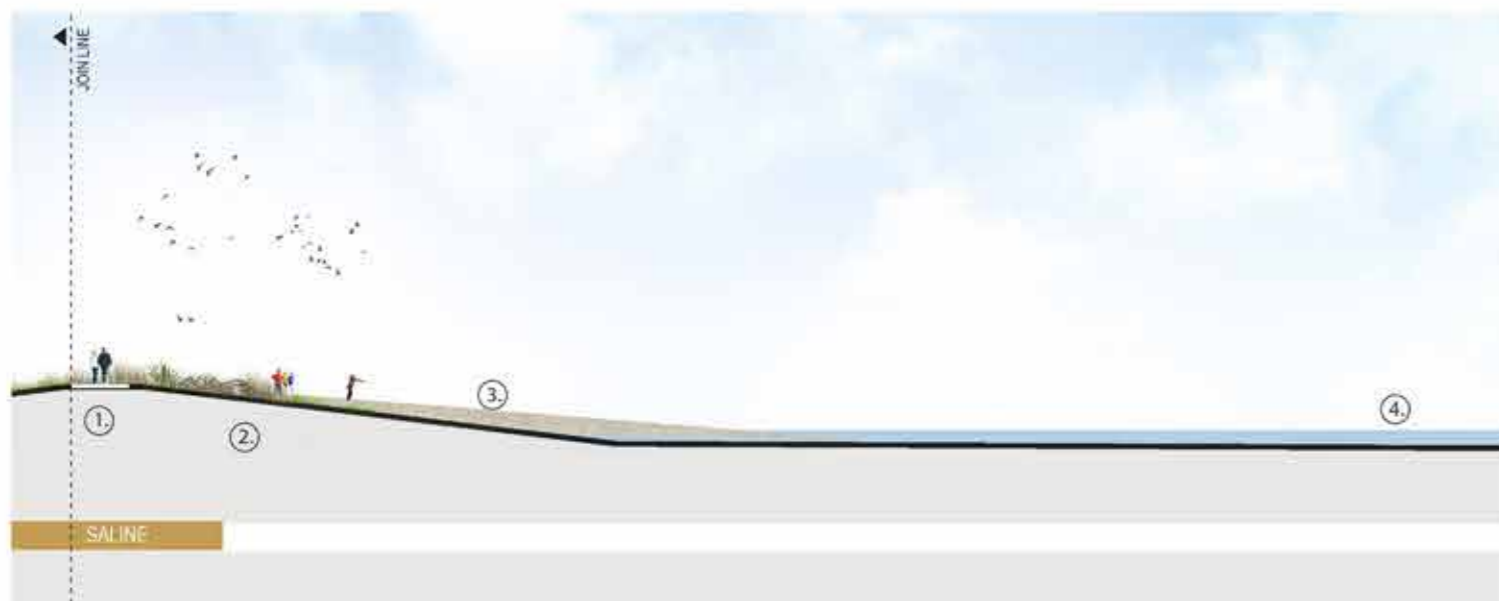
Sector 2: Lower Captain Springs Road: Street Section B4
